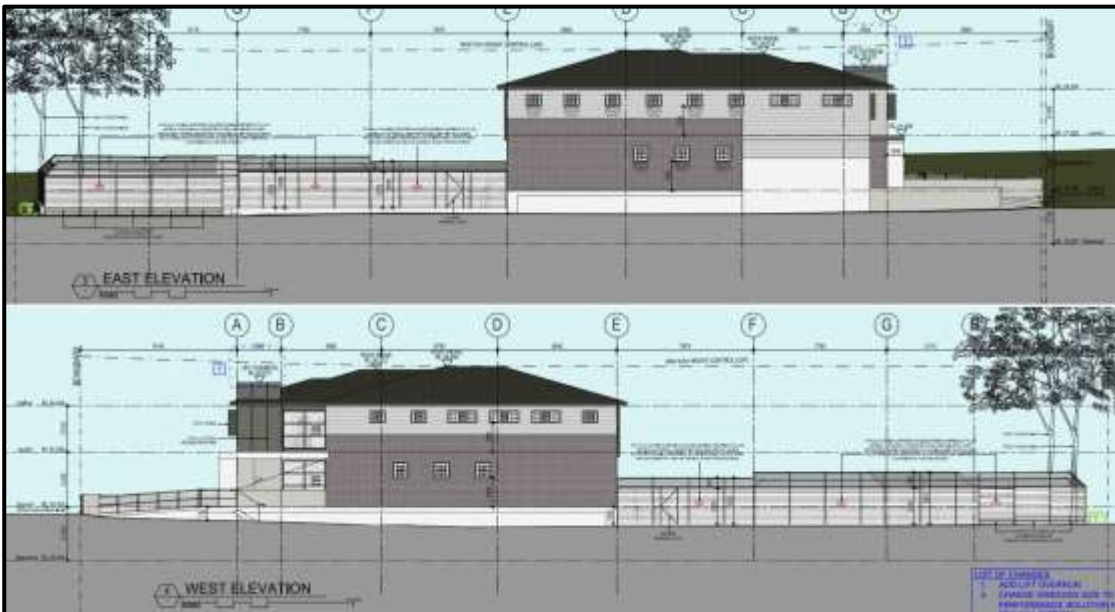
Proposed east and west elevations – not the proposed lift overrun
